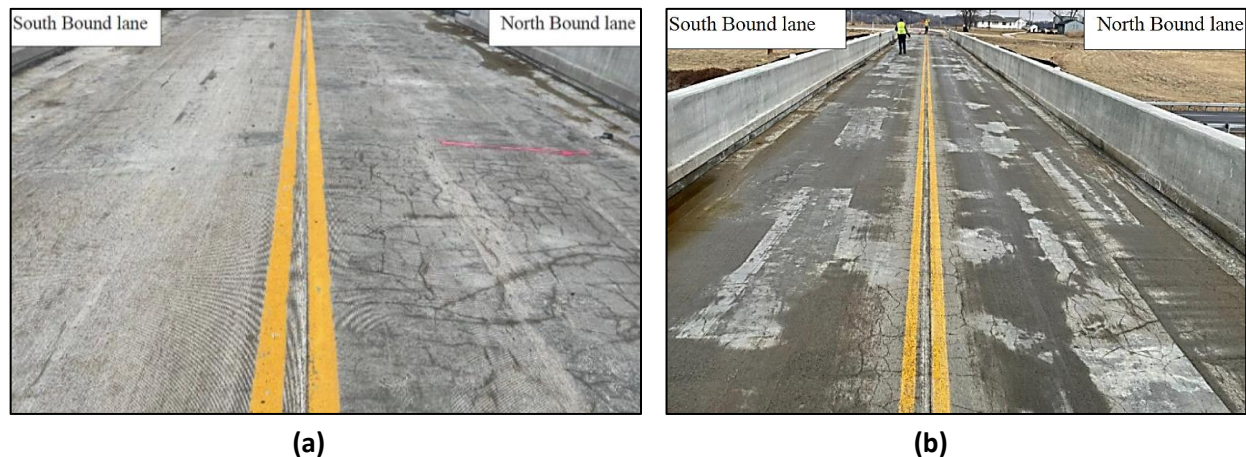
Overlay cracking in (a) Route Z Bridge 96 days after placement, (b) Route M Bridge 81 days after placement (Missouri DOT 2023).
